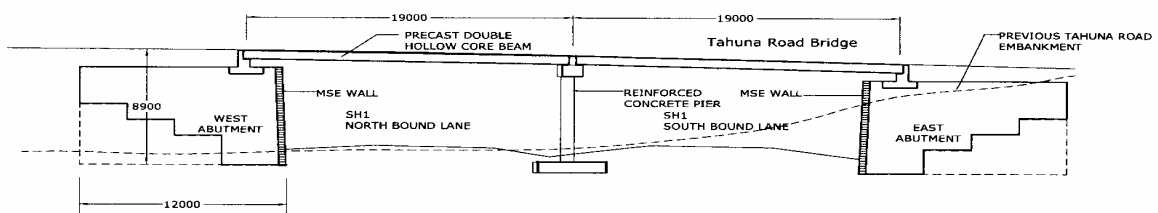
Typical Cross Section of Tahuna Road Overbridge Crossing State Highway SH1
